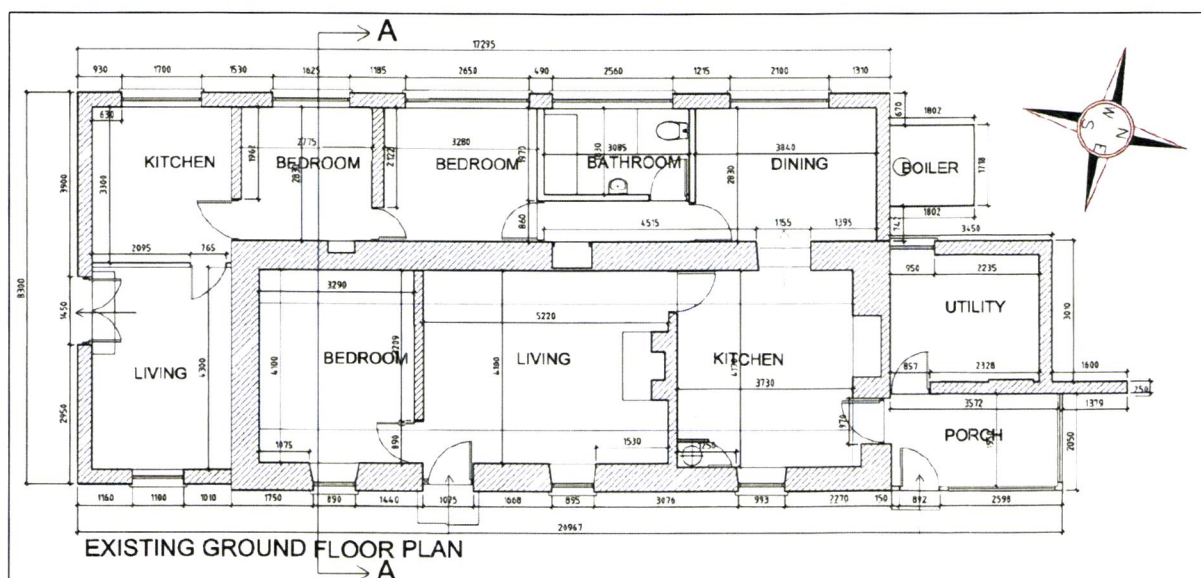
Excerpt from Drawing No. 1811/200 as submitted in the Section 5 application, showing thicker walls indicating likely original cottage before extension.
